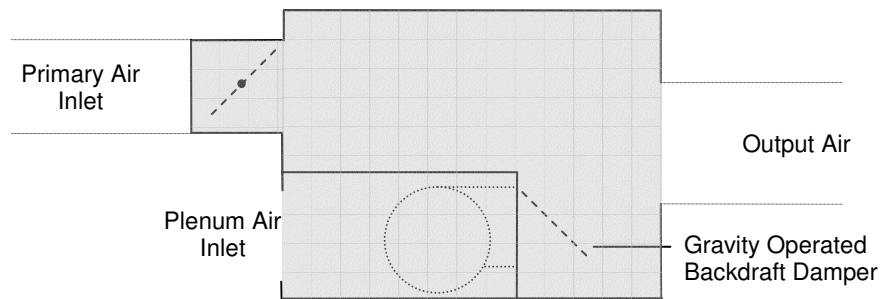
Schematic of Group B Parallel Terminal Units, plan view
